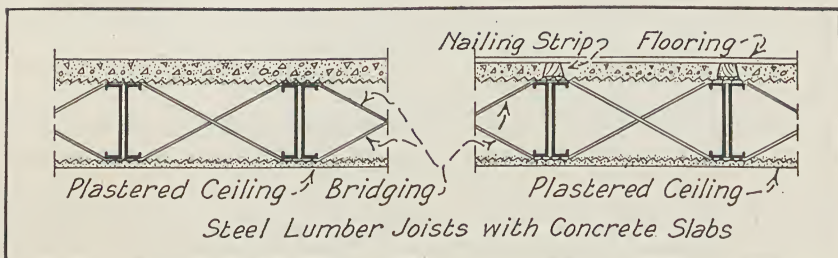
Pressed Steel Joists with Concrete Floor Slabs
